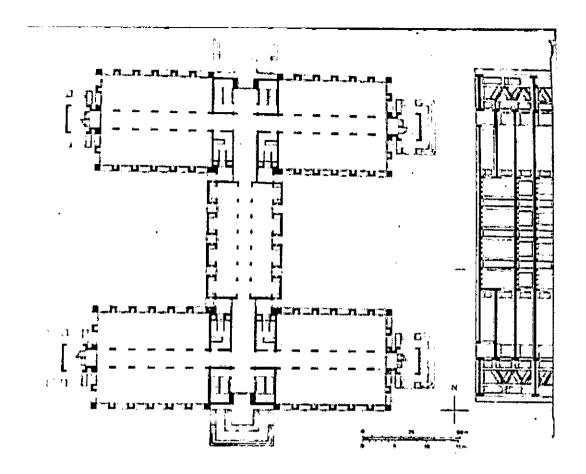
Plan and section of the building, part of which has been completed as shown in the photographs later.
